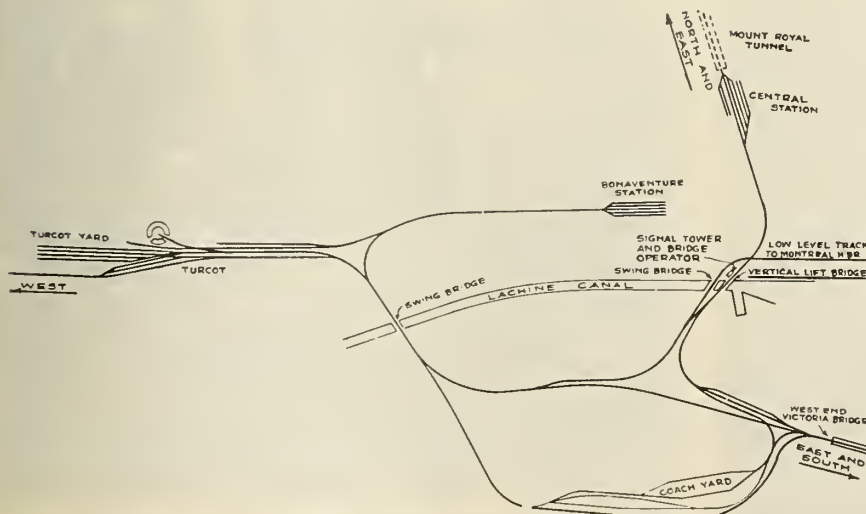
Diagram showing track connection to C.N.R. new passenger station in Montreal, and location of lift bridge across the Lachine canal.
